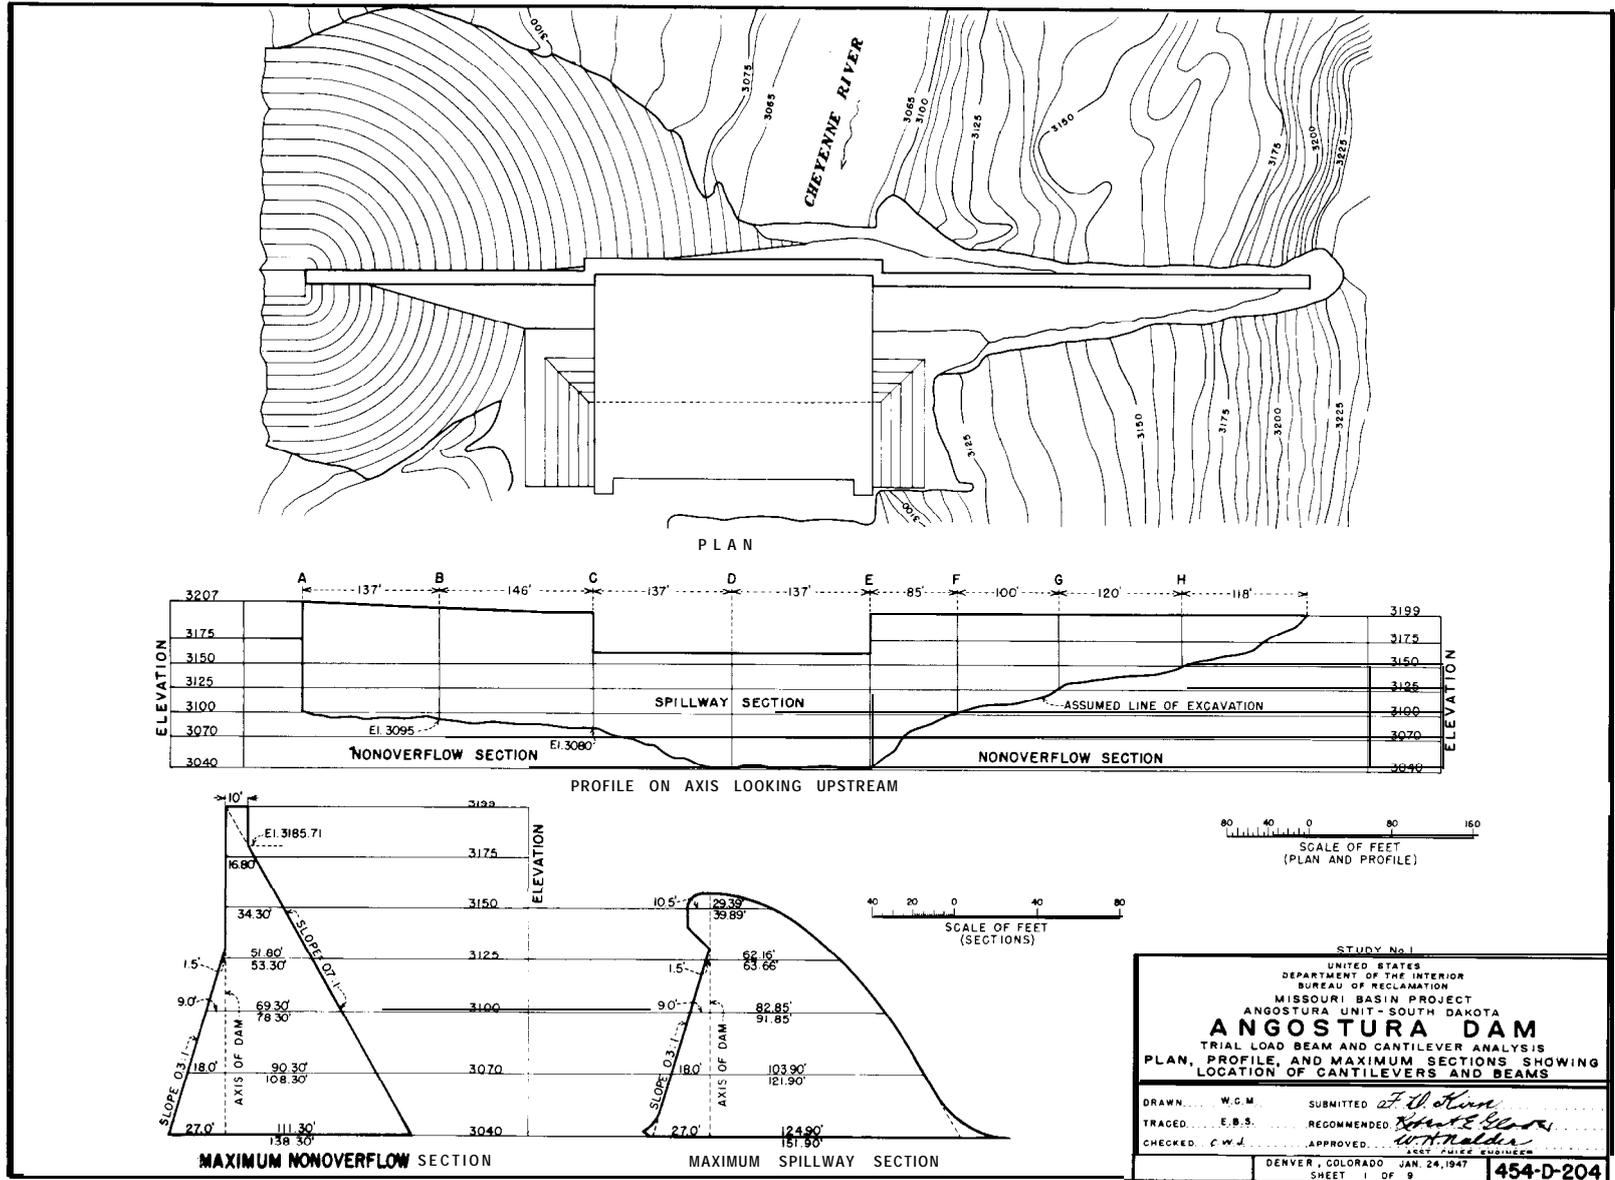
Angostura Dam-plan, profile, and maximum section.
